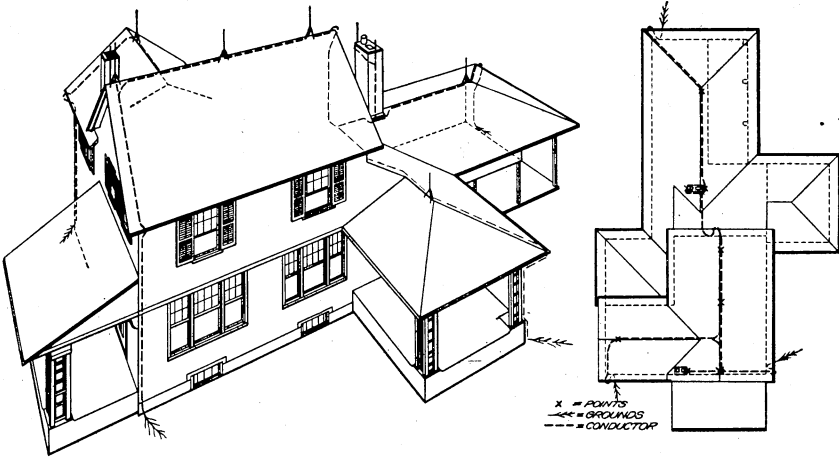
Method of installing lightning conductors to protect a large, 2-story farmhouse, having an L and 2 porches. Note method of carrying conductor around the chimney.
